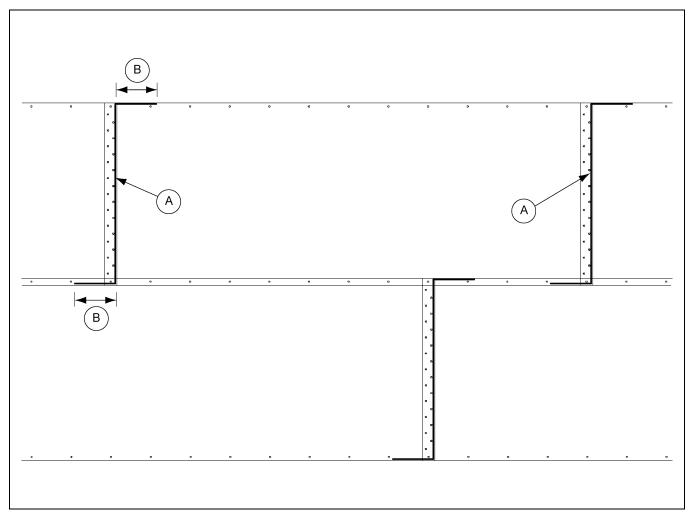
B Standard Sidewall Sheets as Viewed from the Outside of the Bin
